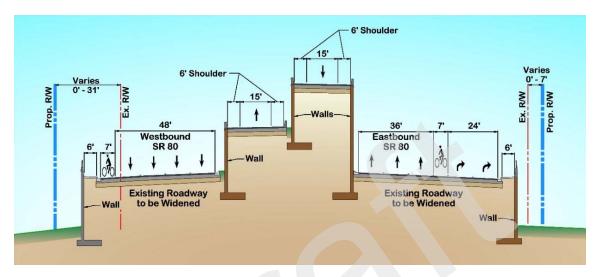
Proposed Typical Section – Alternative 4, SR 80 West of I-95
